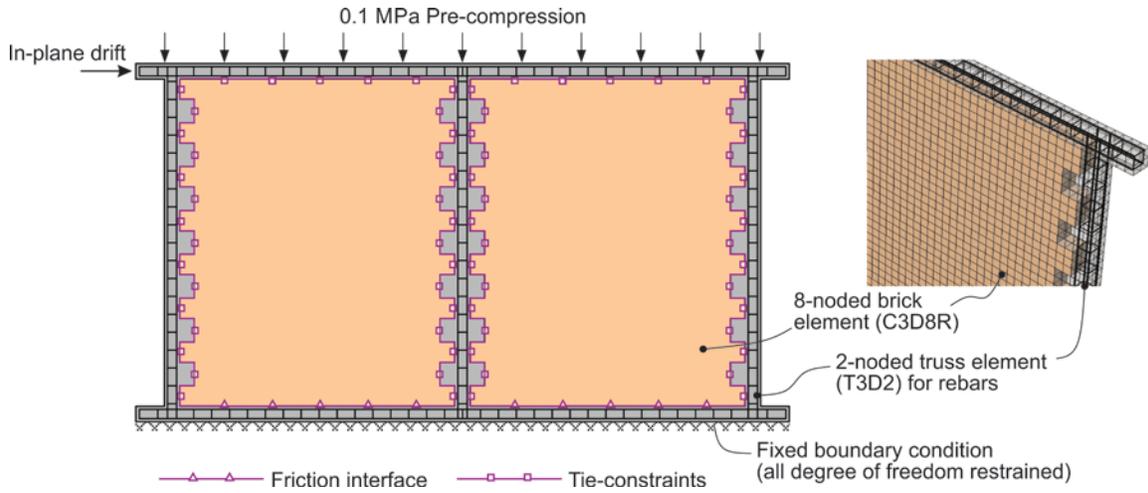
Schematic diagram of a typical wall illustrating various elements used in the finite element analyses
